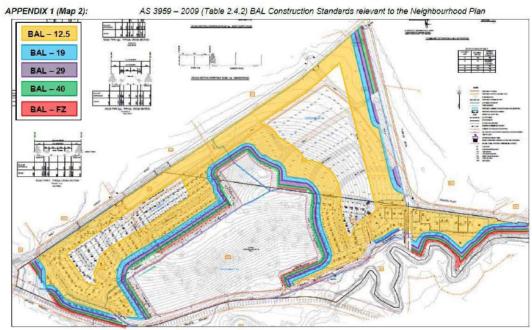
BAL Construction Standards relevant to the Neighbourhood Plan
